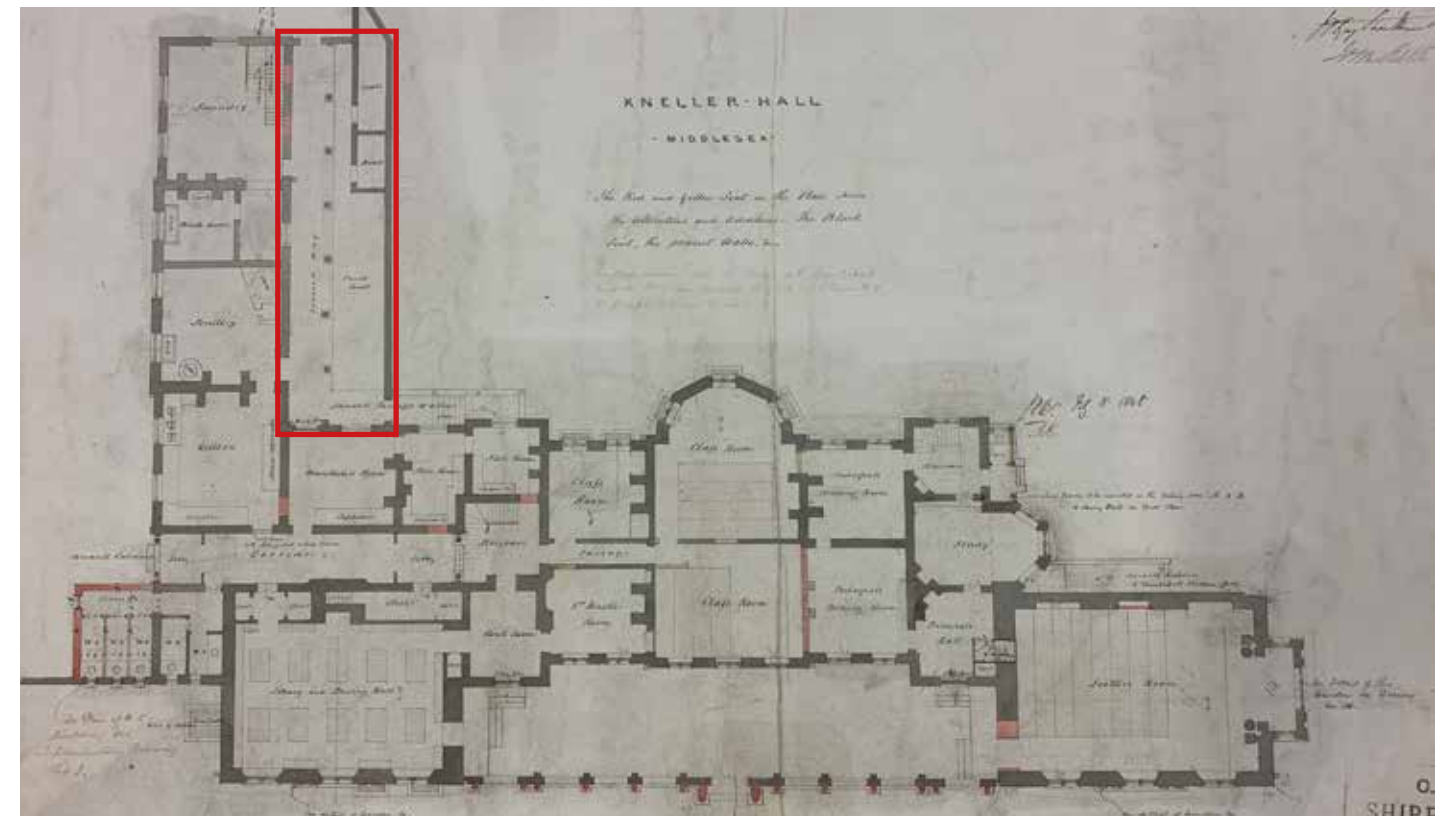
1848 proposed ground floor plan of Kneller Hall, unrealised (black showing the existing building and red showing the proposal). Red = 'covered way'. By George Mair.
